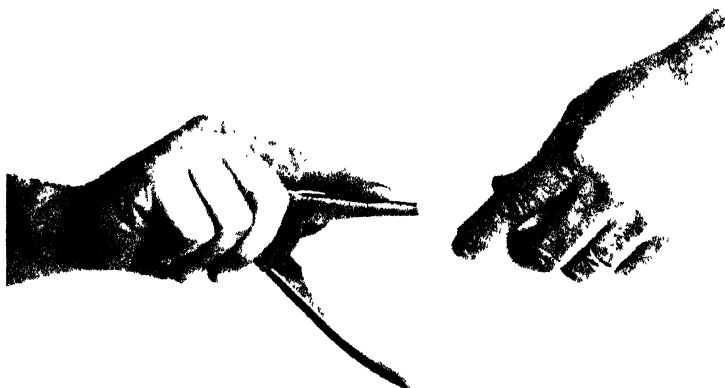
Punching a hole in the plug of gelignite, showing the correct position of the hands and gelignite when making the hole with crimpers.
